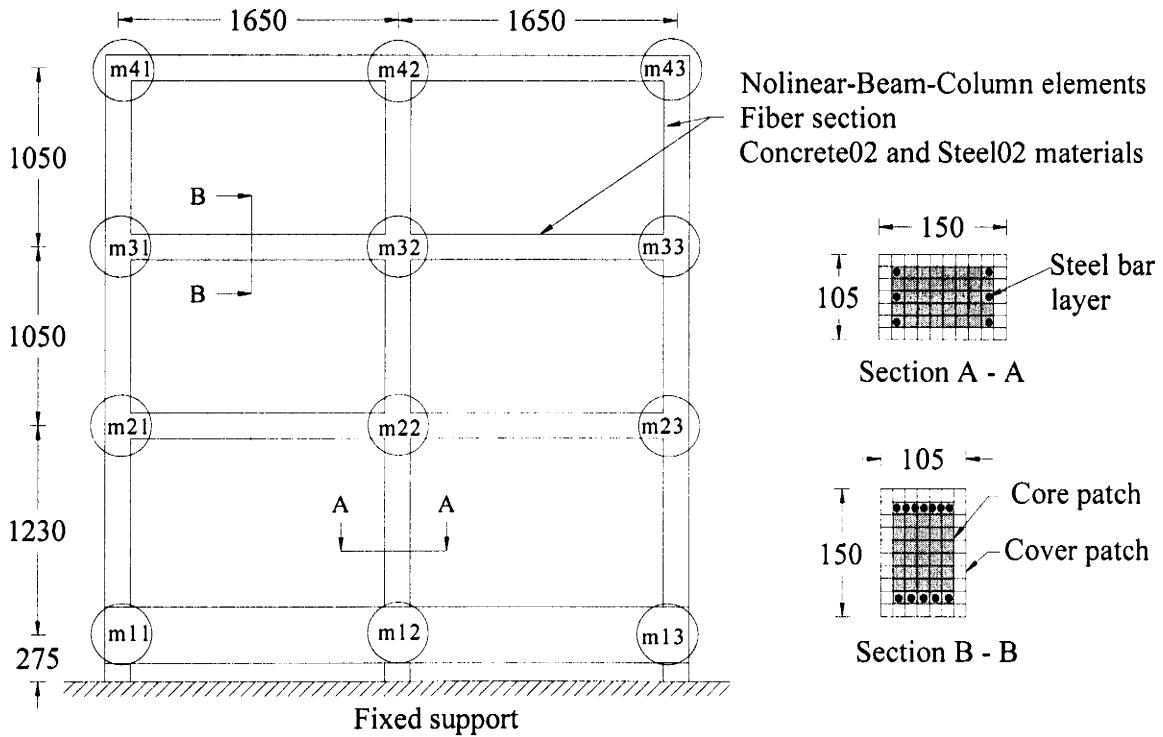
Numerical model of bare frame structure together with the section details of beams and columns (m: point mass; dimensions are in mm)
